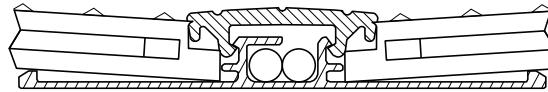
Picture Above Shows Joining Trim Stepped On
